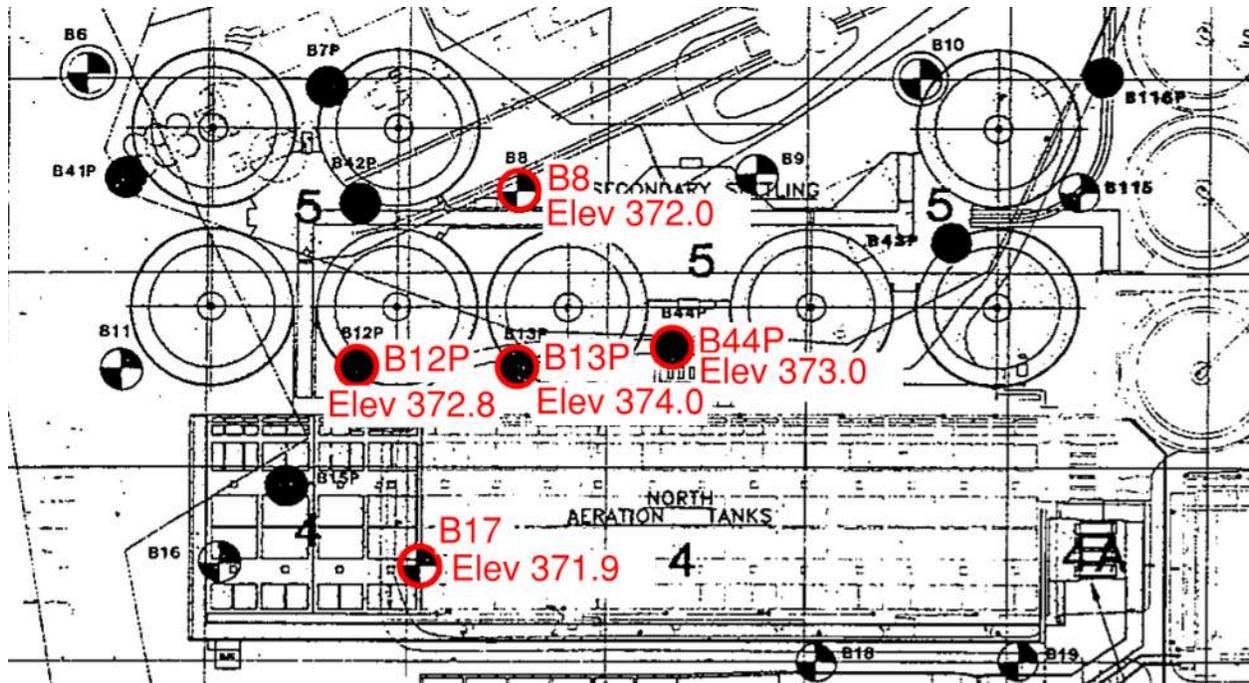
Geotechnical Borings Available Near Proposed RAS Splitter Box
